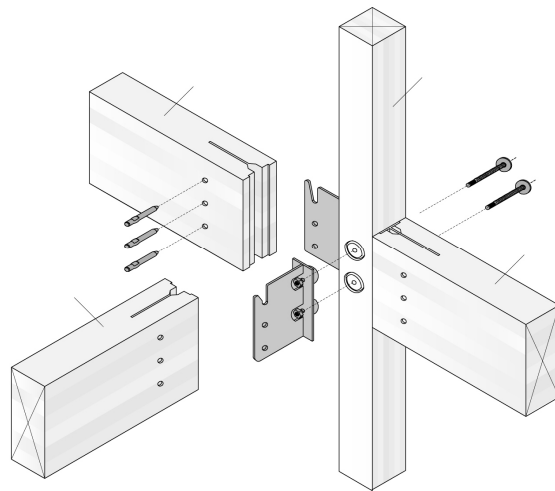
SE-structure detail of connection between: beams, pillars and connectors
